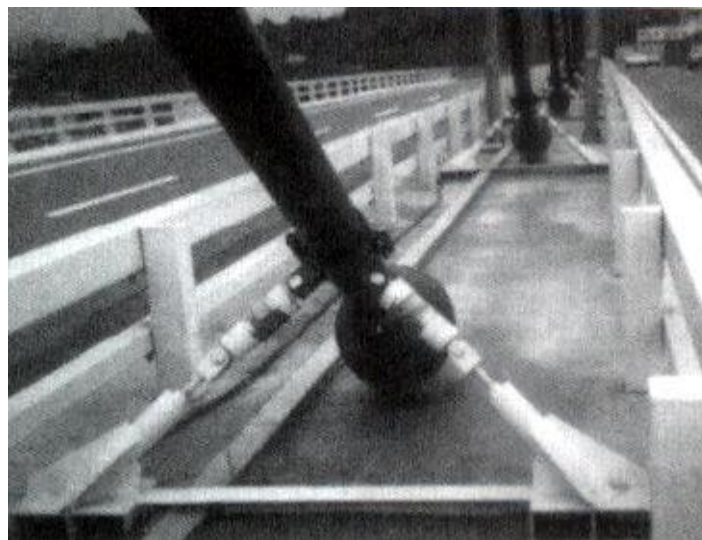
(b)– Hydraulic damper at Aratsu bridge.
